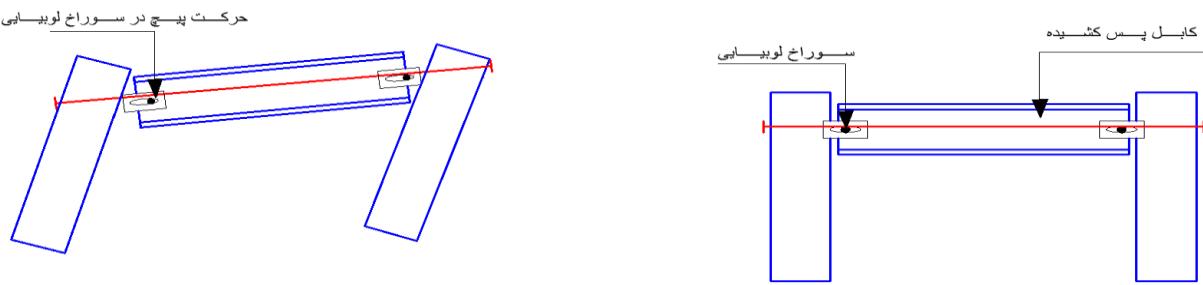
self-centering Steel plate shear Wall System (SC-BSPSW) [11]
